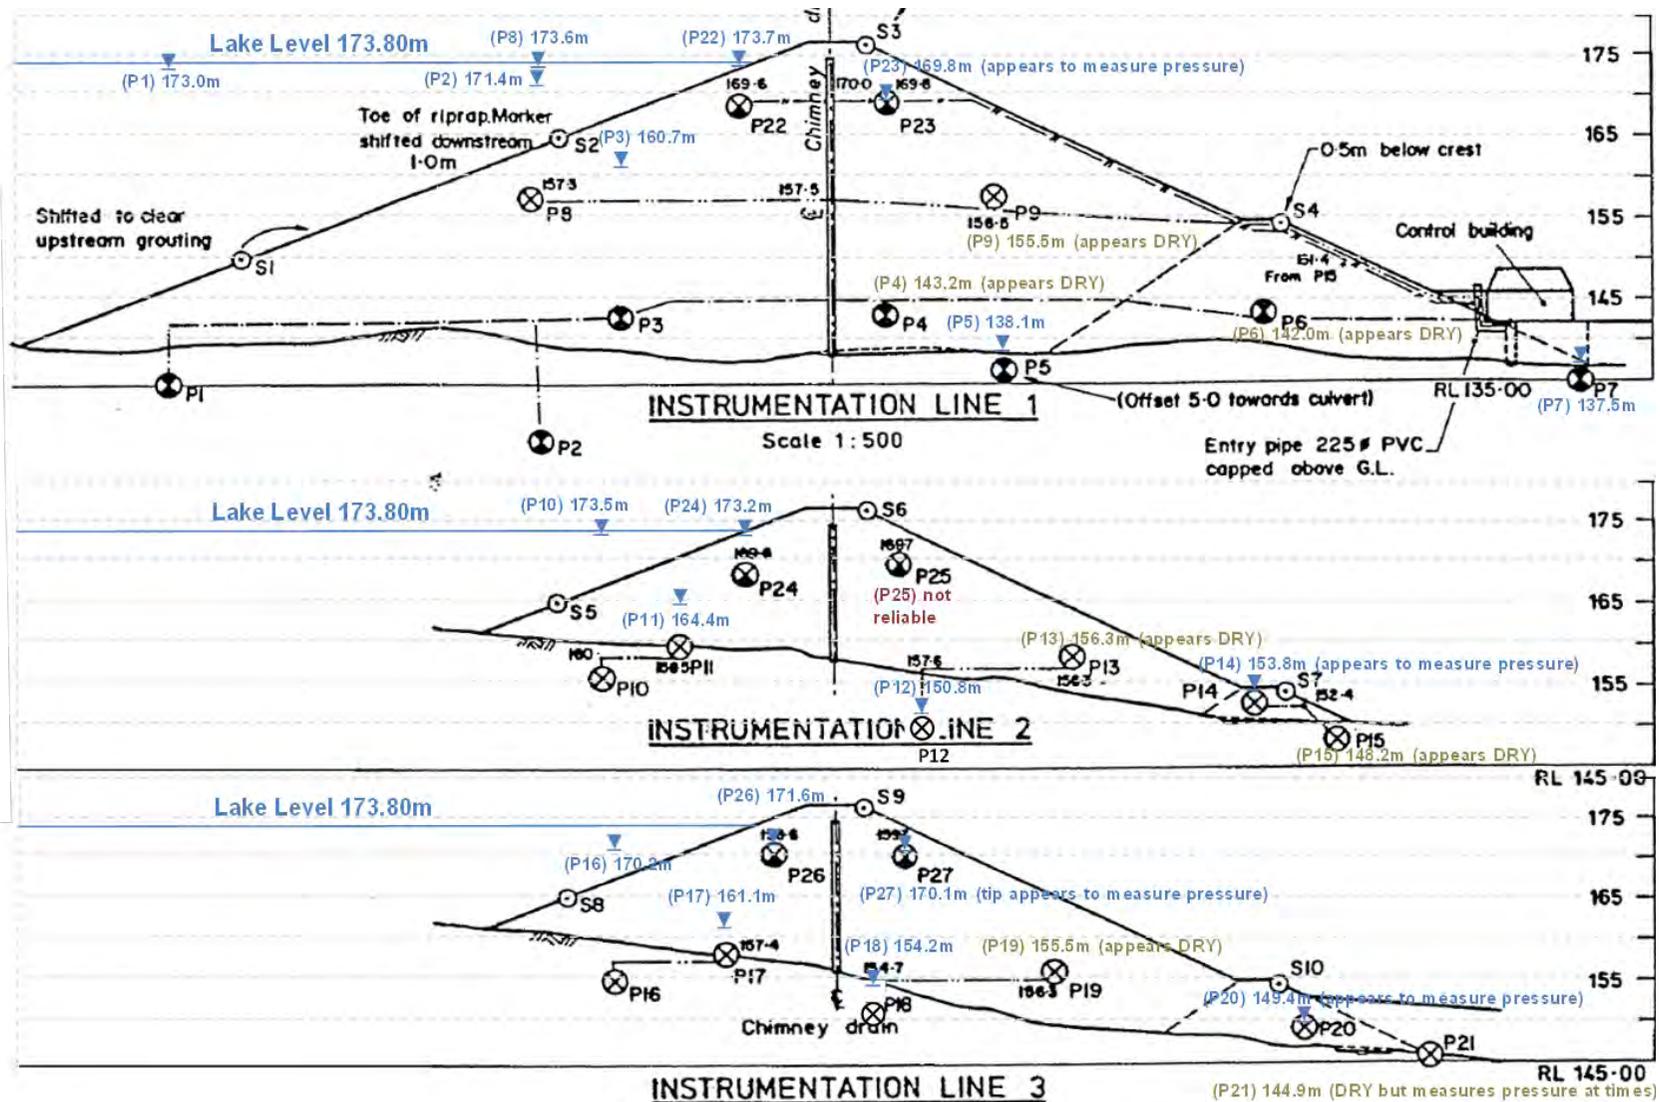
Maitai Dam – Piezometer Instrument Lines 1, 2 and 3 Cross Sections with 2/1/14 Readings
